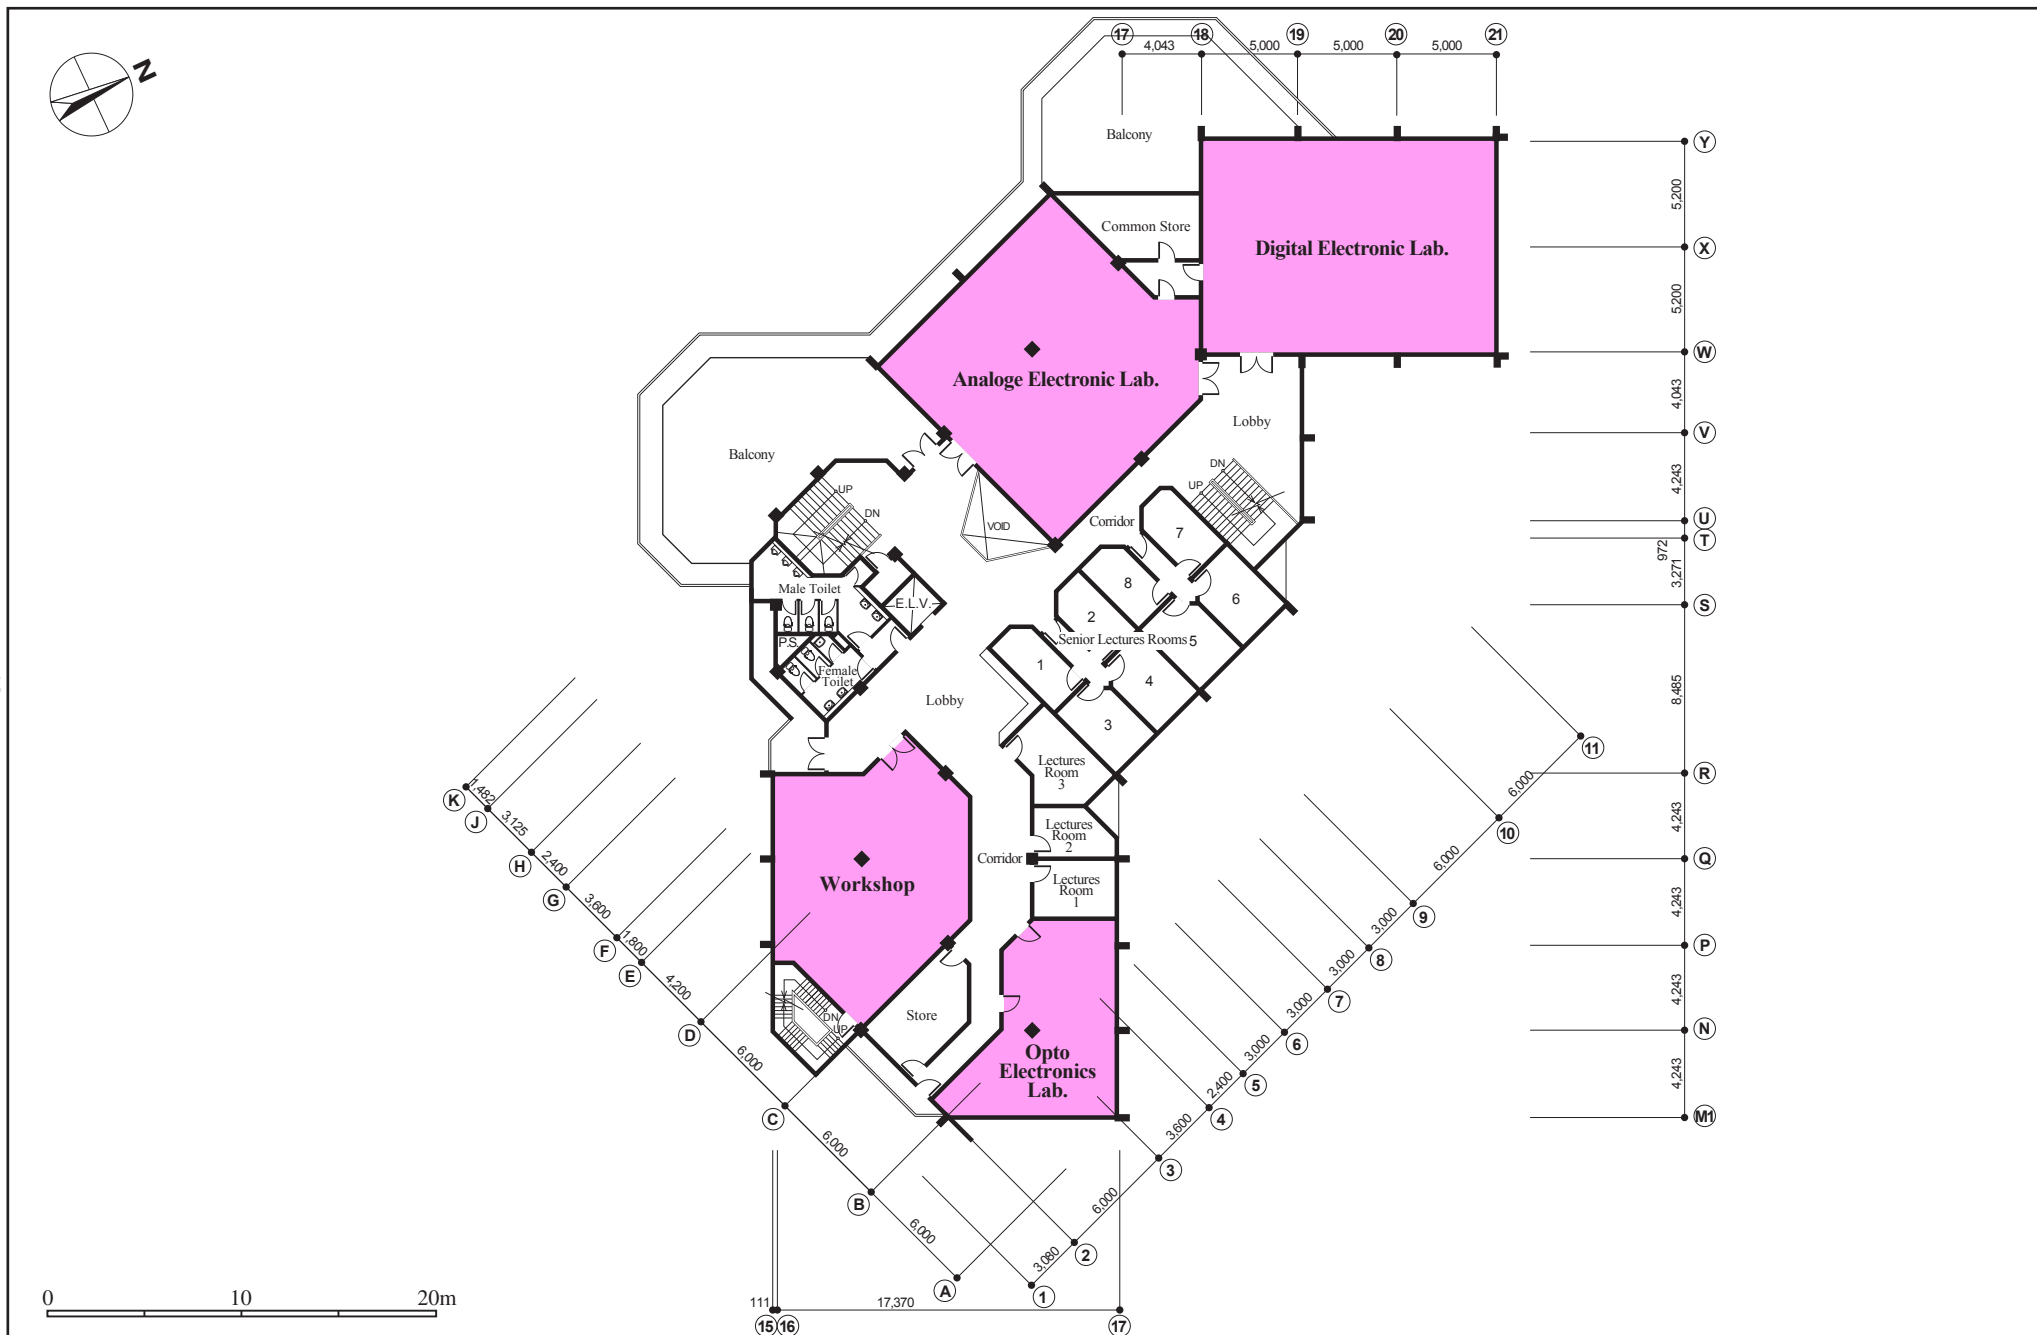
Second Floor Plan of New Building for Department of Electronics & Telecommunication Engineering
